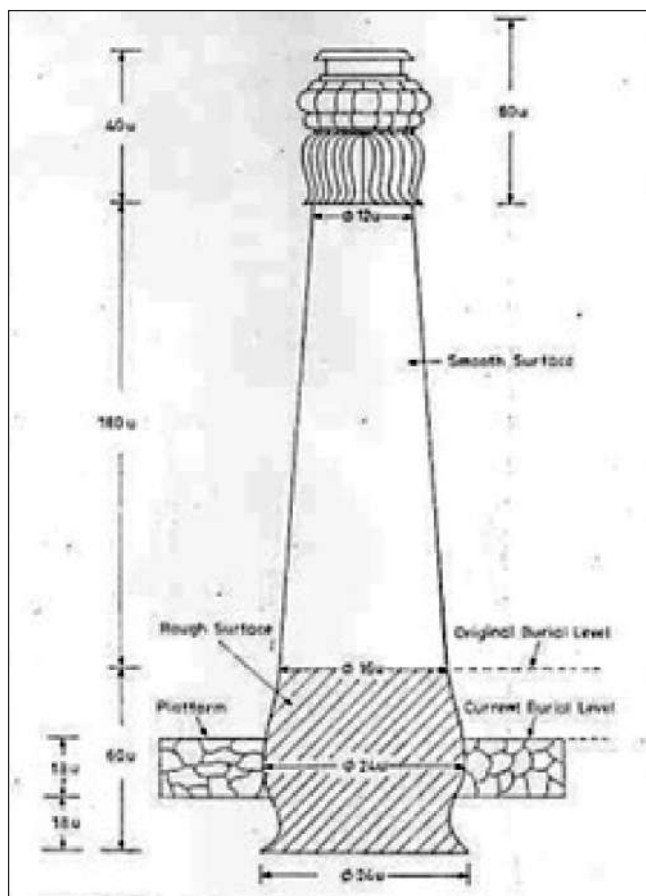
Dimensions of the Delhi iron pillar. The unit U measures 1"
